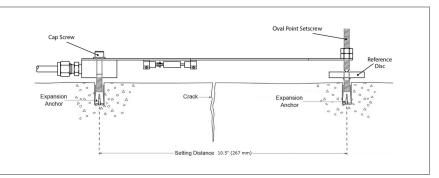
Crackmeter assembly using reference disk and two anchors
